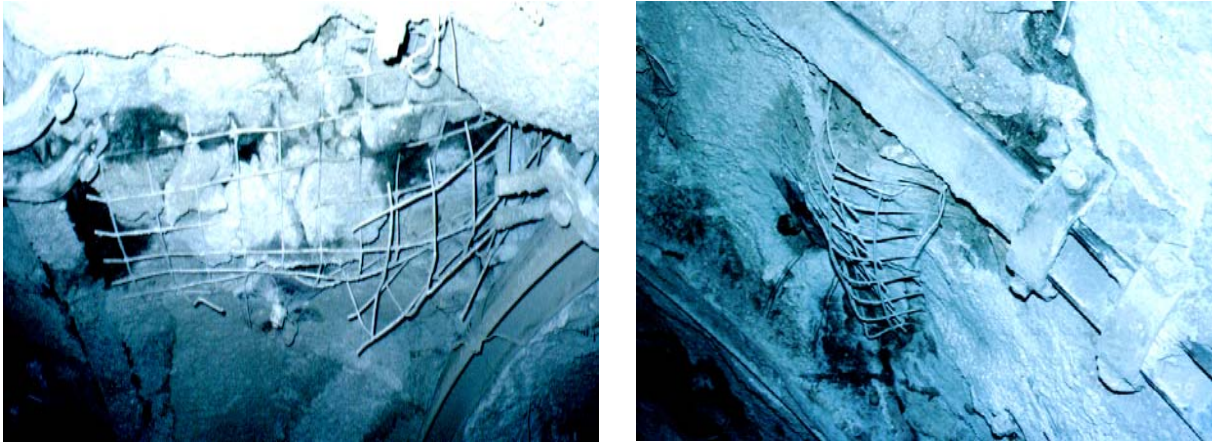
“Semmering” railway tunnel / Austria; two photographs of the profile enlargement constructed with a conventional shotcrete-rock bolt-steel arch support showing the damaged lining
